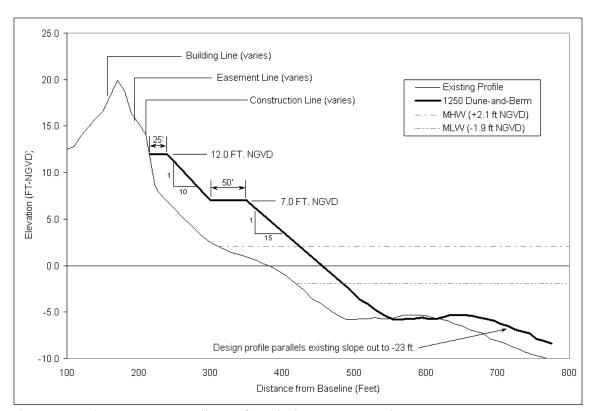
Plan 1250X, Locally Preferred Plan, Cross Section
